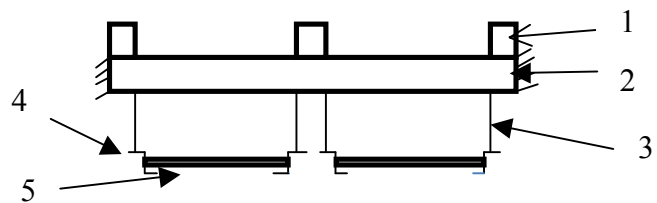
Mechanical schemes 1-longitudinal beam ; 2 – cro ss beam ; 3-rolls chain ; 4-platform beam
